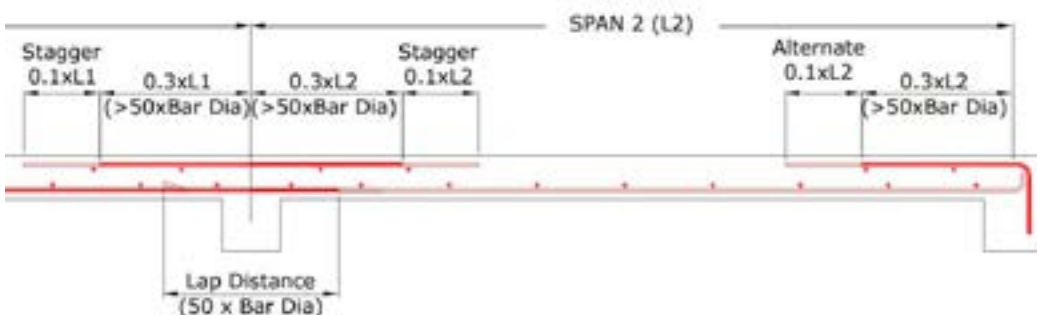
B - SLAB REBAR LAYOUT - SPAN 2
